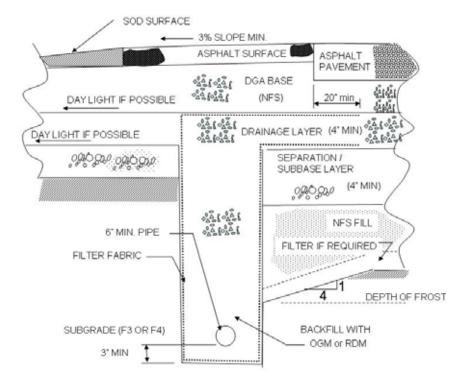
Typical Edge Subdrain Detail for Flexible Pavement (Non-Frost Areas)
